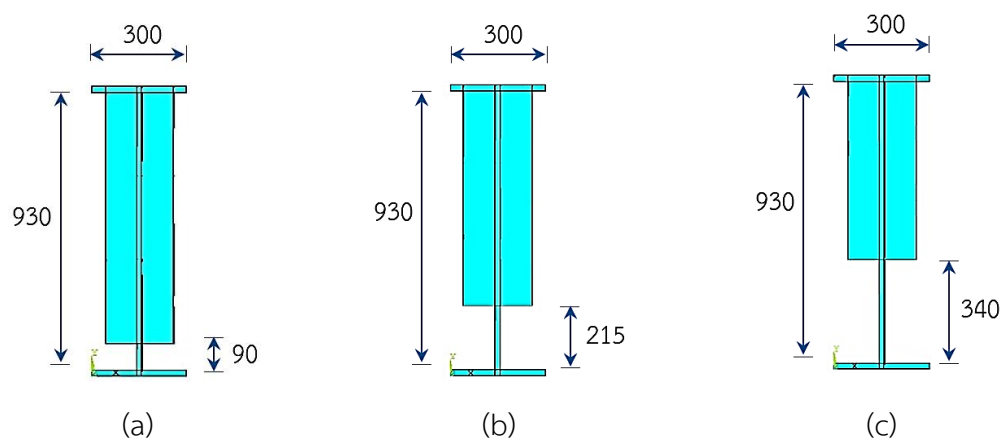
Cross section of steel I-beams with different web gap lengths (a) 90 mm (b) 215 mm (c) 340 mm
